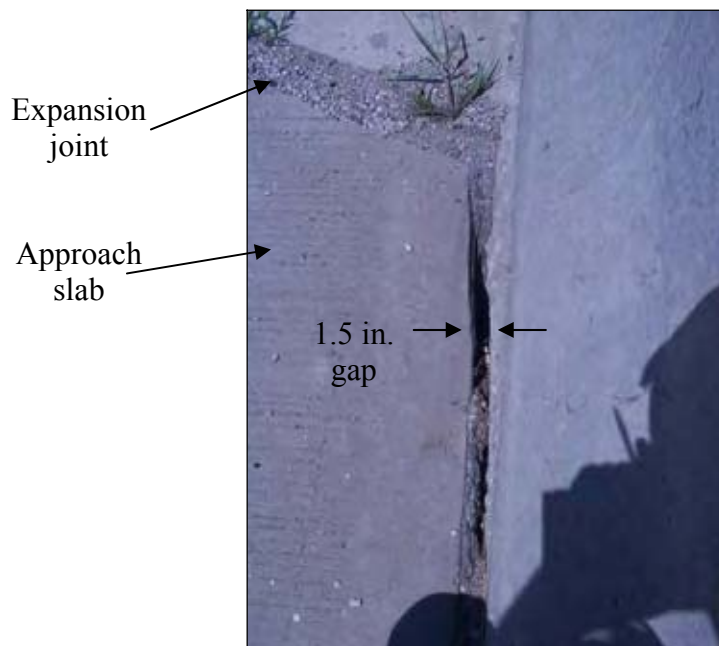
Gap between the approach slab and the wingwall (South end of NBL)
